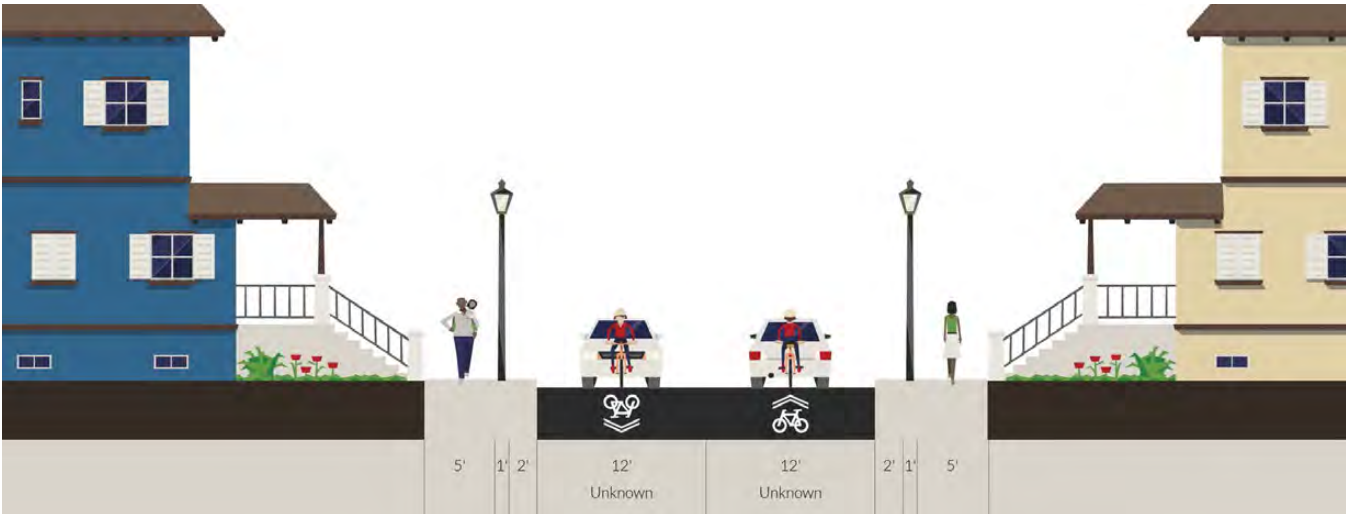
Cross Section: Lincoln St. – Rone Ave. to Caldwell Park (Downtown Boundary)
